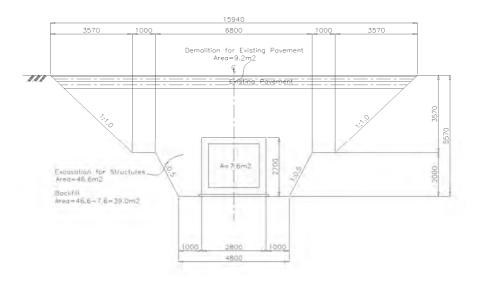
Typical Cross Section of Excavation for Box Culvert
